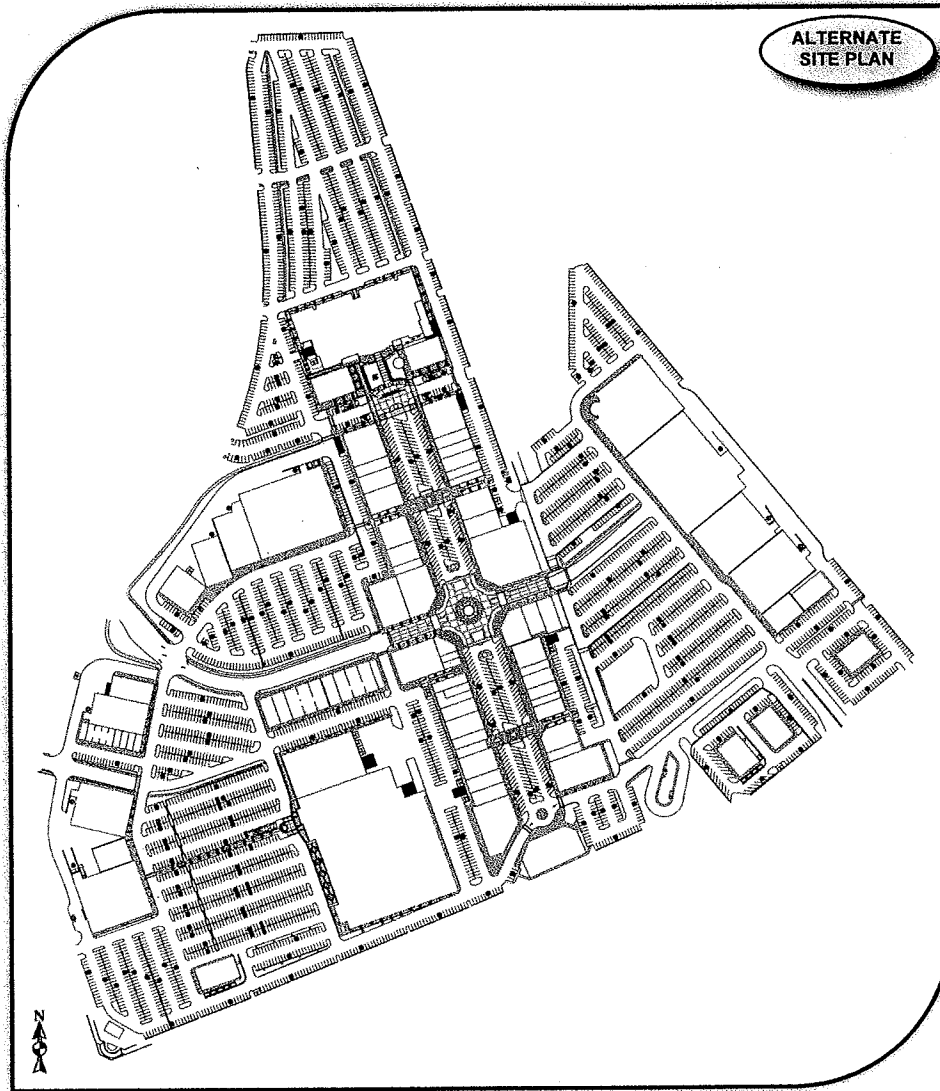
Proposed Draft Sub Area Plan Alternative (Oday Consultants 12/07)
